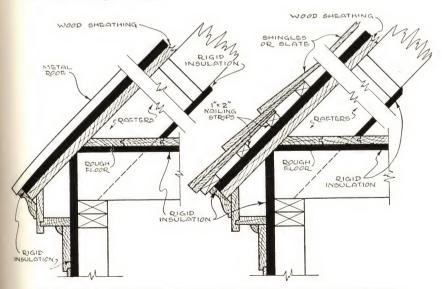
Same as Fig. 169 Except That Rigid Insulation Is Used over Wood Sheathing
